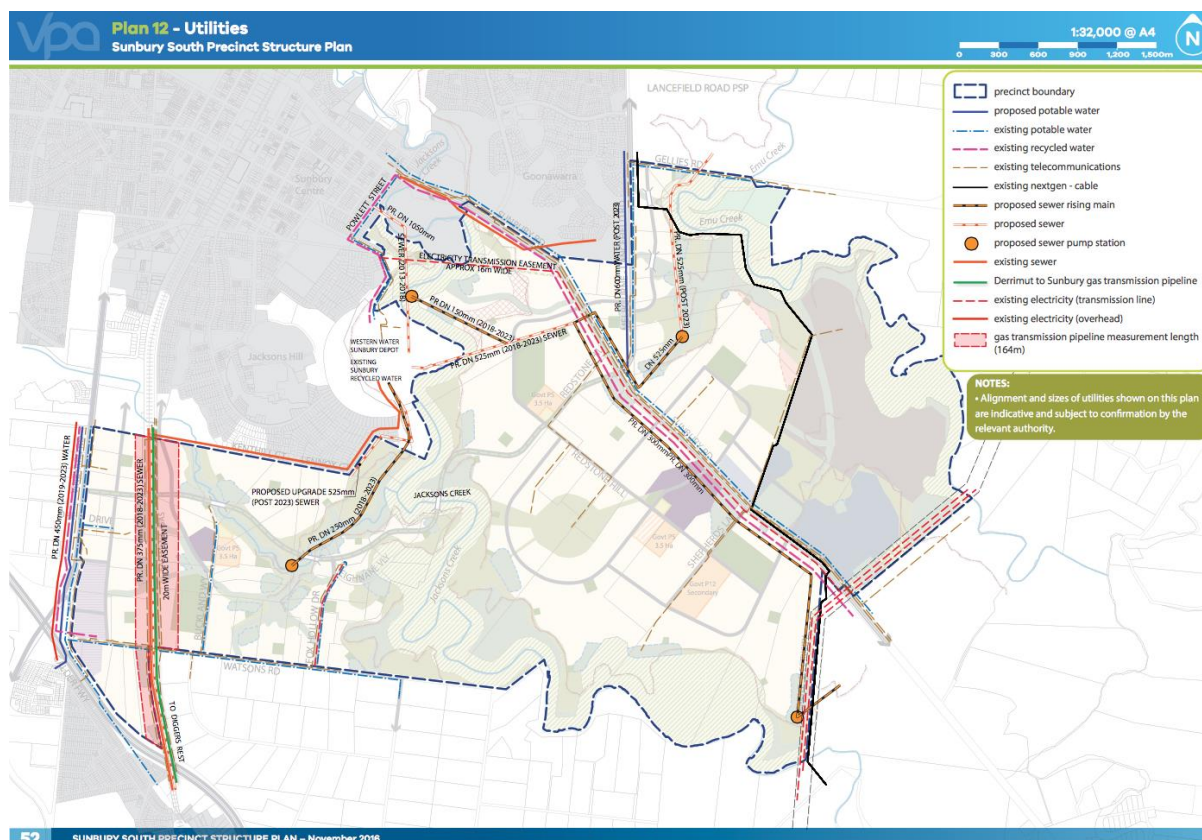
Plan 12, Utilities, Sunbury South Precinct Structure Plan
